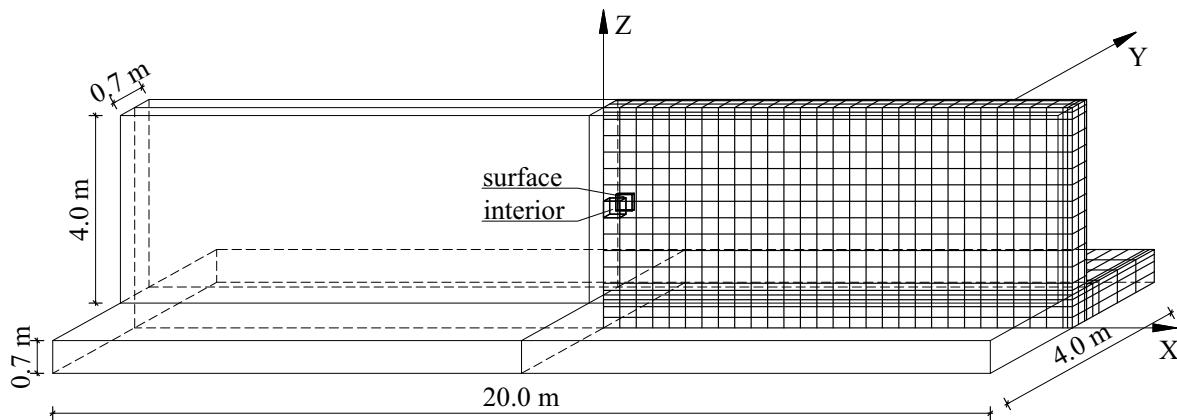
Geometry of the analyzed reinforced concrete wall with the assumed finite element mesh
